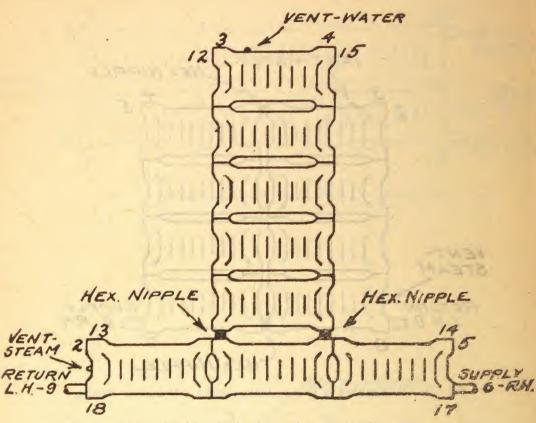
Assembled in single tier and single stack. Water or one or two pipe steam.
